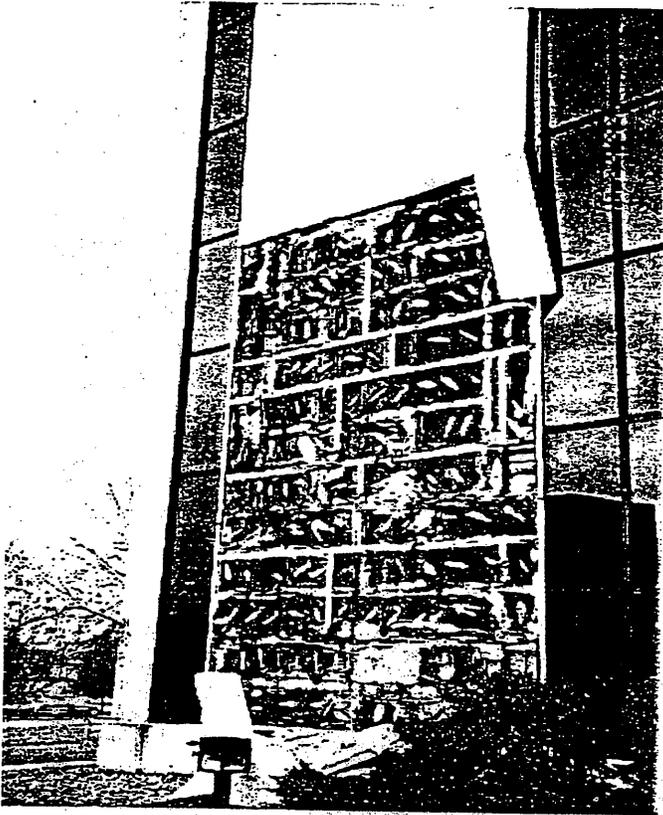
Three full panels at the south elevation became dislodged from the building in October 1995.
